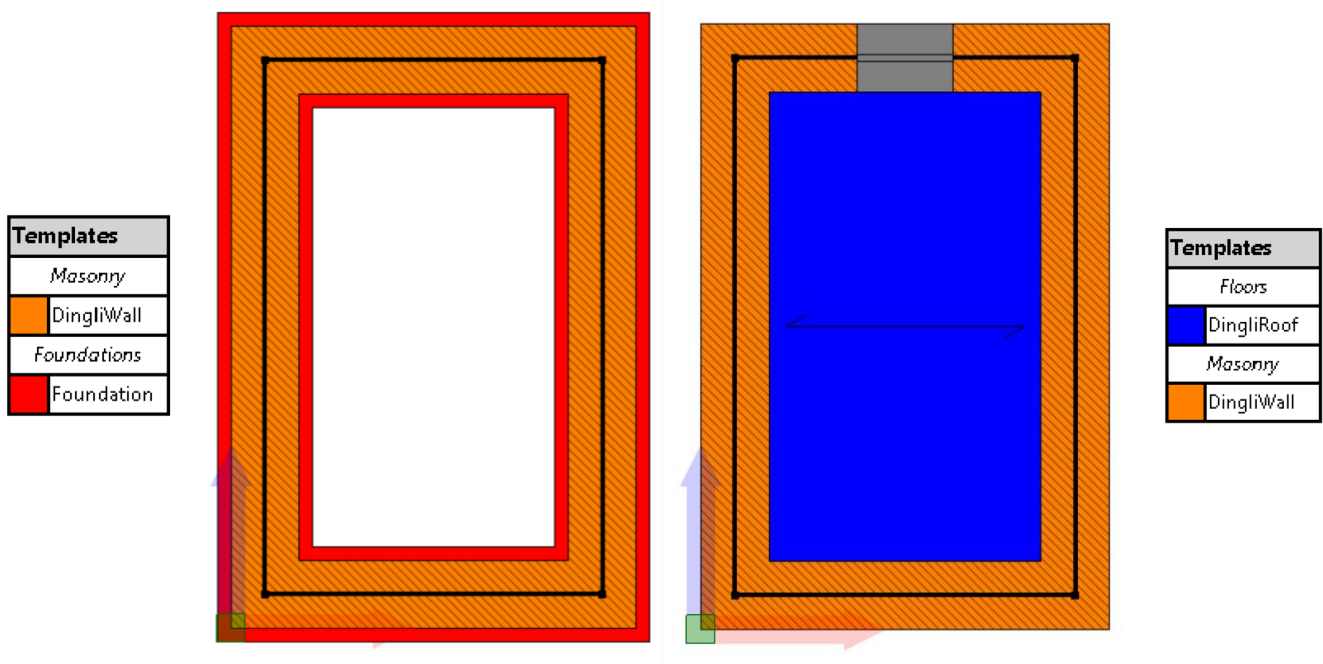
3D Macro Plan from 0 – 800 mm and 800mm – 6440 mm Layout of St Mary Magdalene Chapel in Dingli.
